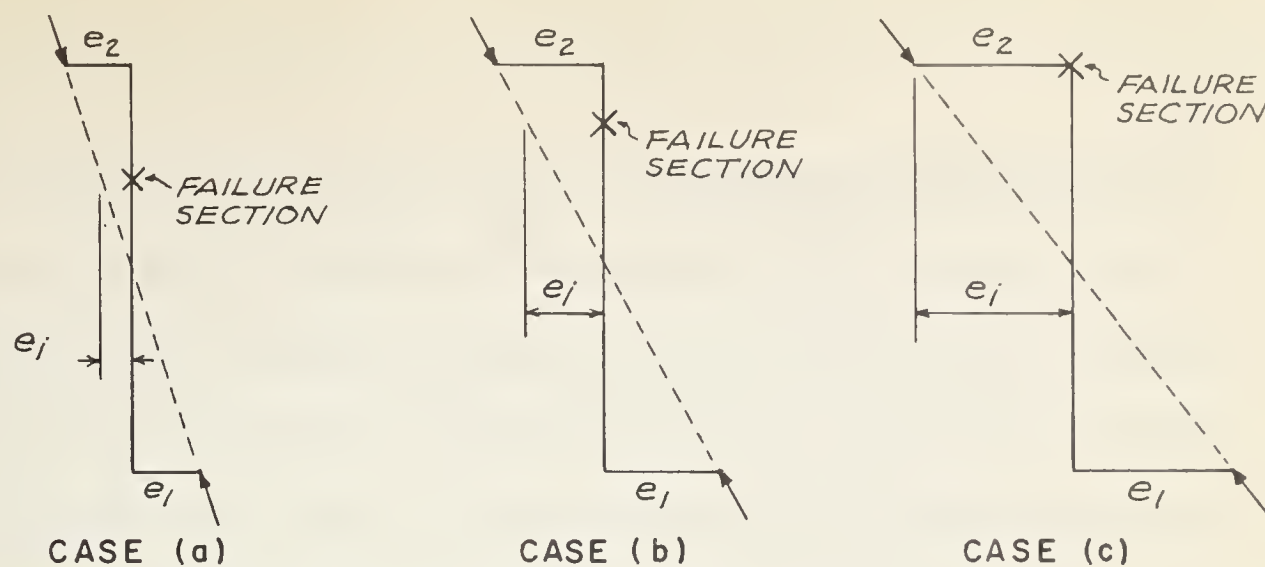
LOCATION OF FAILURE SECTIONS
